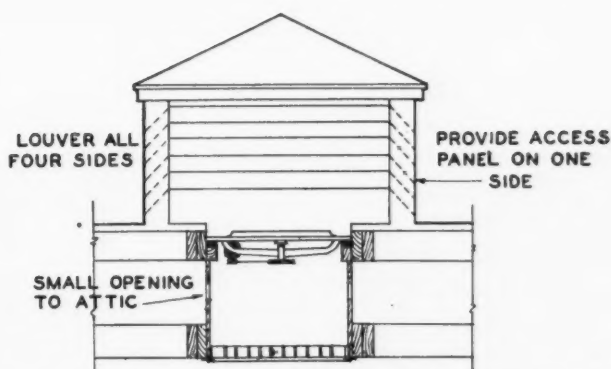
Vertical exhaust installation for a shallow attic. Fan discharges into penthouse.
